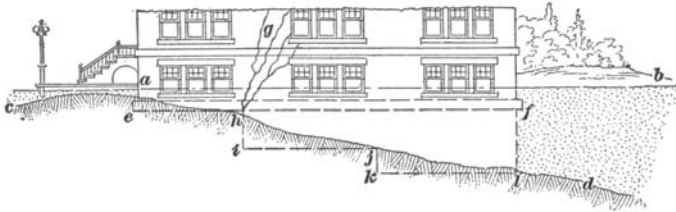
When Ralph Peck began teaching foundation engineering at the University of Illinois in 1949 there were few examples of foundation problems or failures he could show his students. This image of tension cracks emanating from a stepped foundation is taken from Lowndes (1928), which Peck drew upon before publishing his article on the history of building foundations in Chicago (Peck, 1948).
